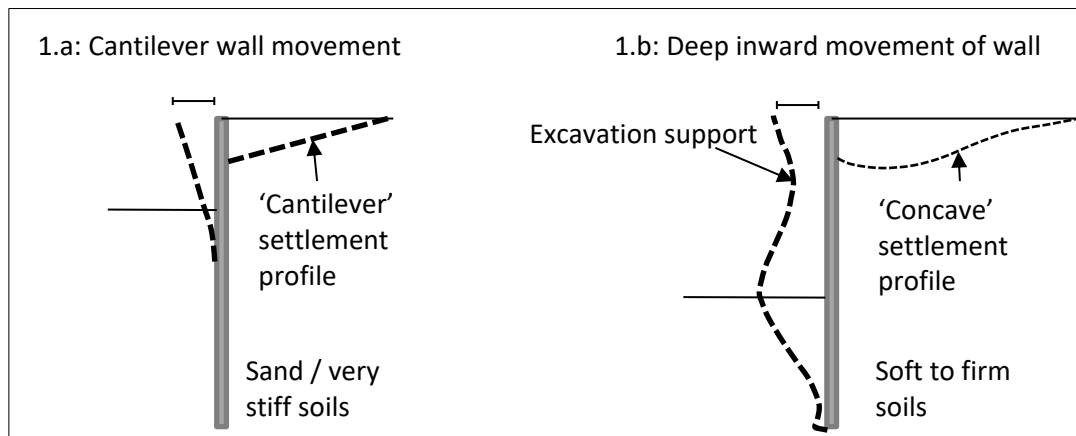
Patterns of wall movement and ground deformations after Gaba, et al. 2017.
